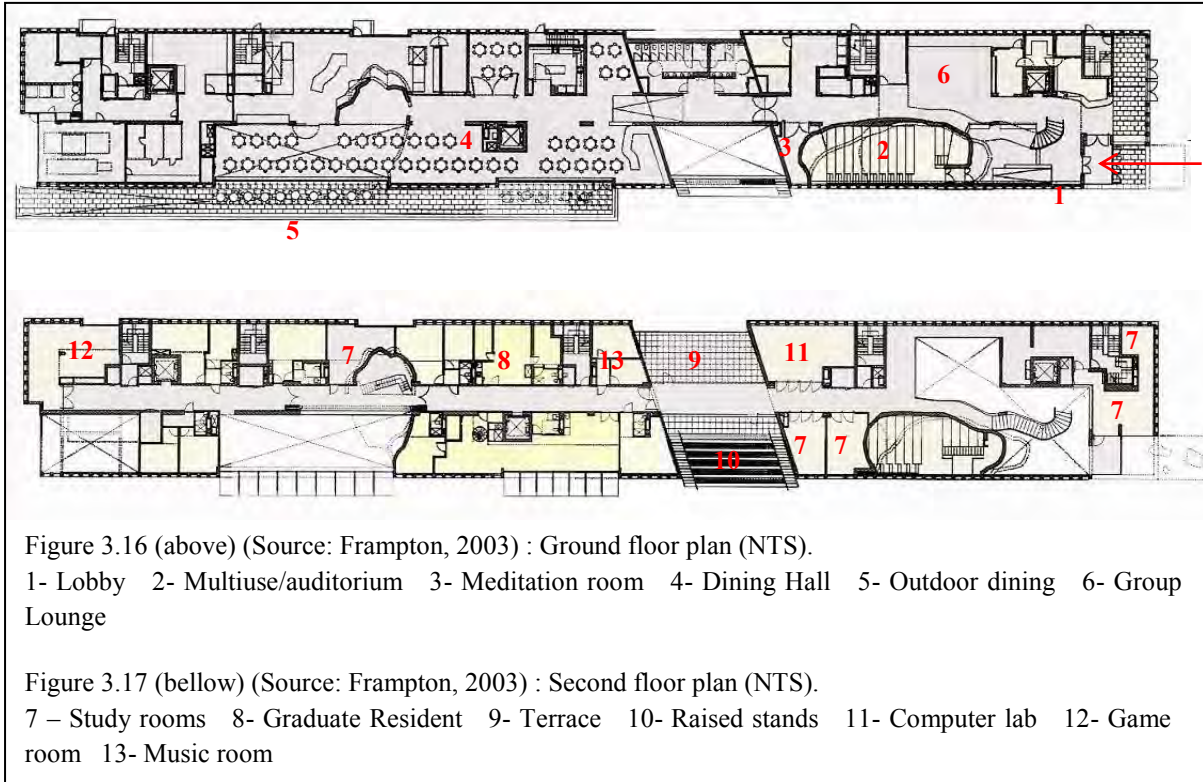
(above) (Source: Frampton, 2003) : Ground floor plan (NTS).
